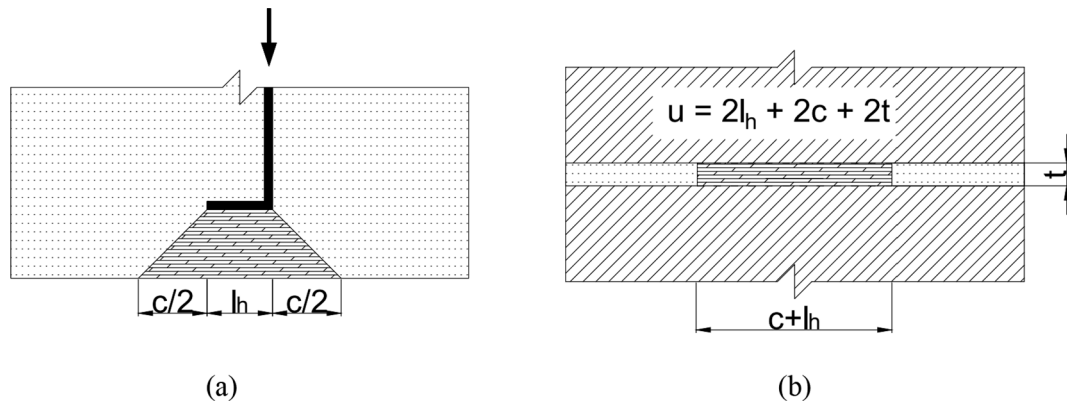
Idealized control perimeter for cavity wall tie specimens for punching failure: mortar joint section (a), front view (b).
